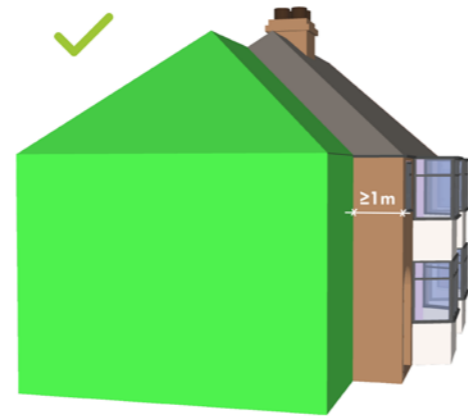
Side extensions should normally be set back at least 1m from the original front house wall
